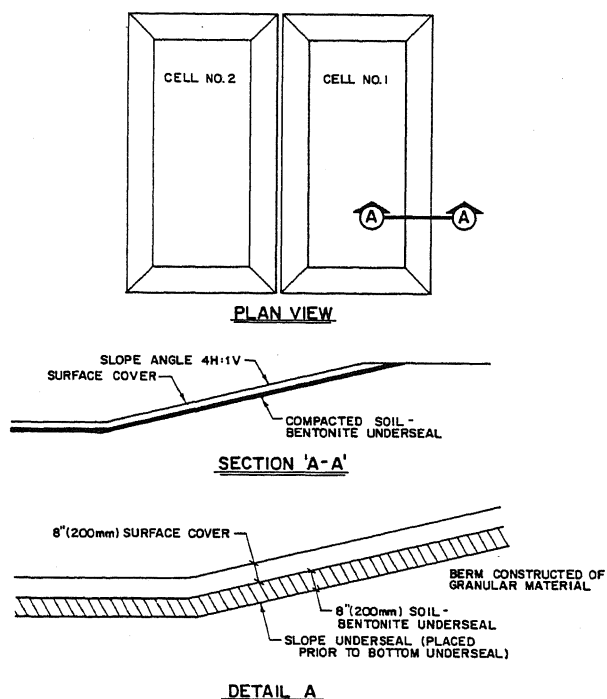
PLAN AND SECTION VIEW OF FINAL LINER DESIGN
